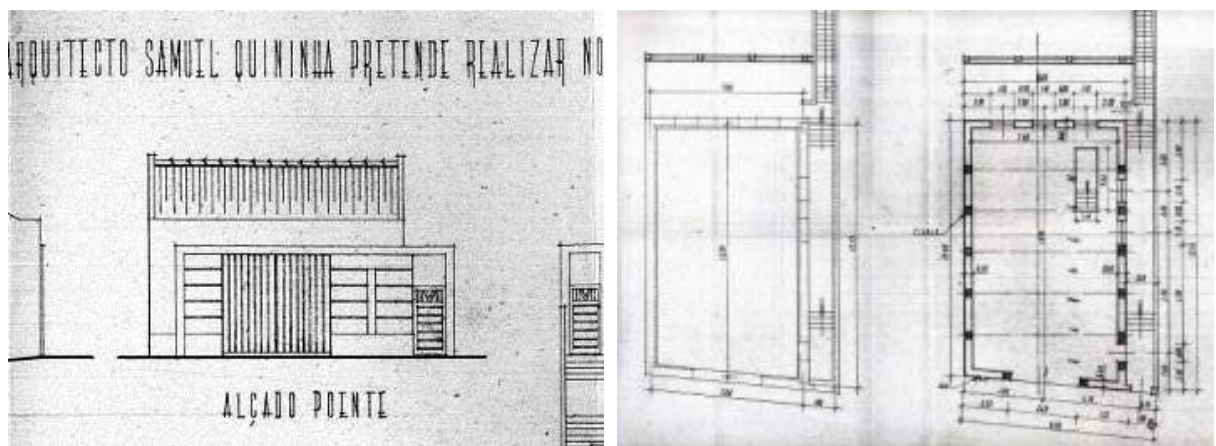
Building design of the architect Samuel Quininha – Garage - future extension for housing, 1946 [credits Alice Tavares]
